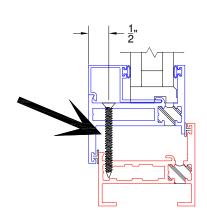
Vent Fastener Location (Block Frame Sill Shown)
